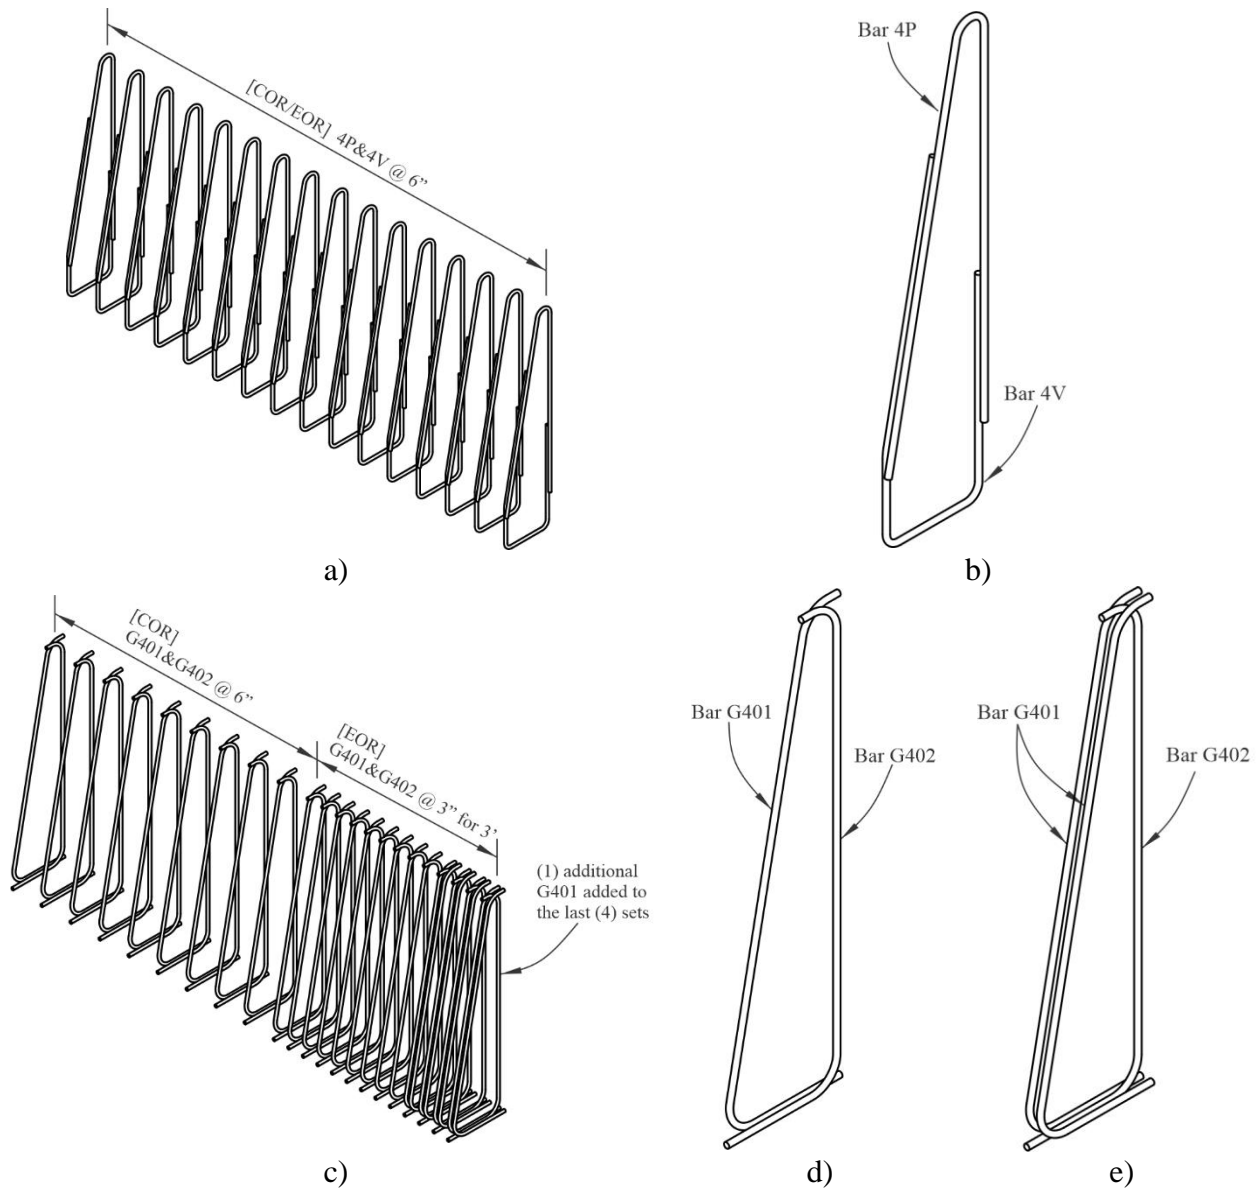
Rail rebar configurations and spacing at center of rail (COR) and end of rail (EOR):
